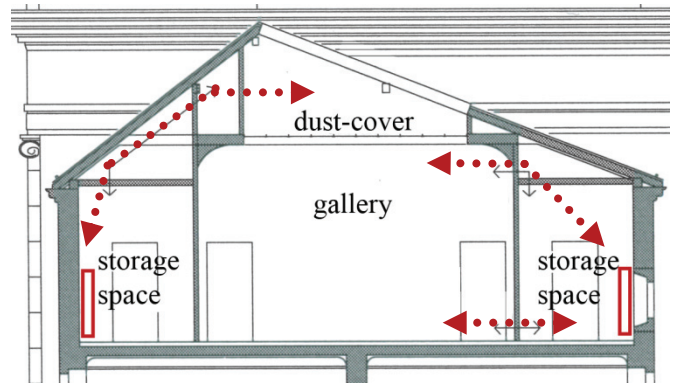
Section showing the heating supply of the interior second floor galleries by air inlets from attic spaces (non-scale division)
